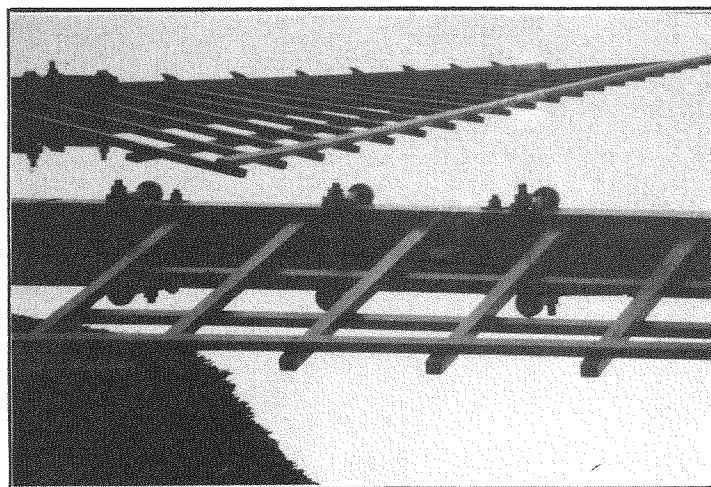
The stocks showing the scarf joint, Durbanville mill.
